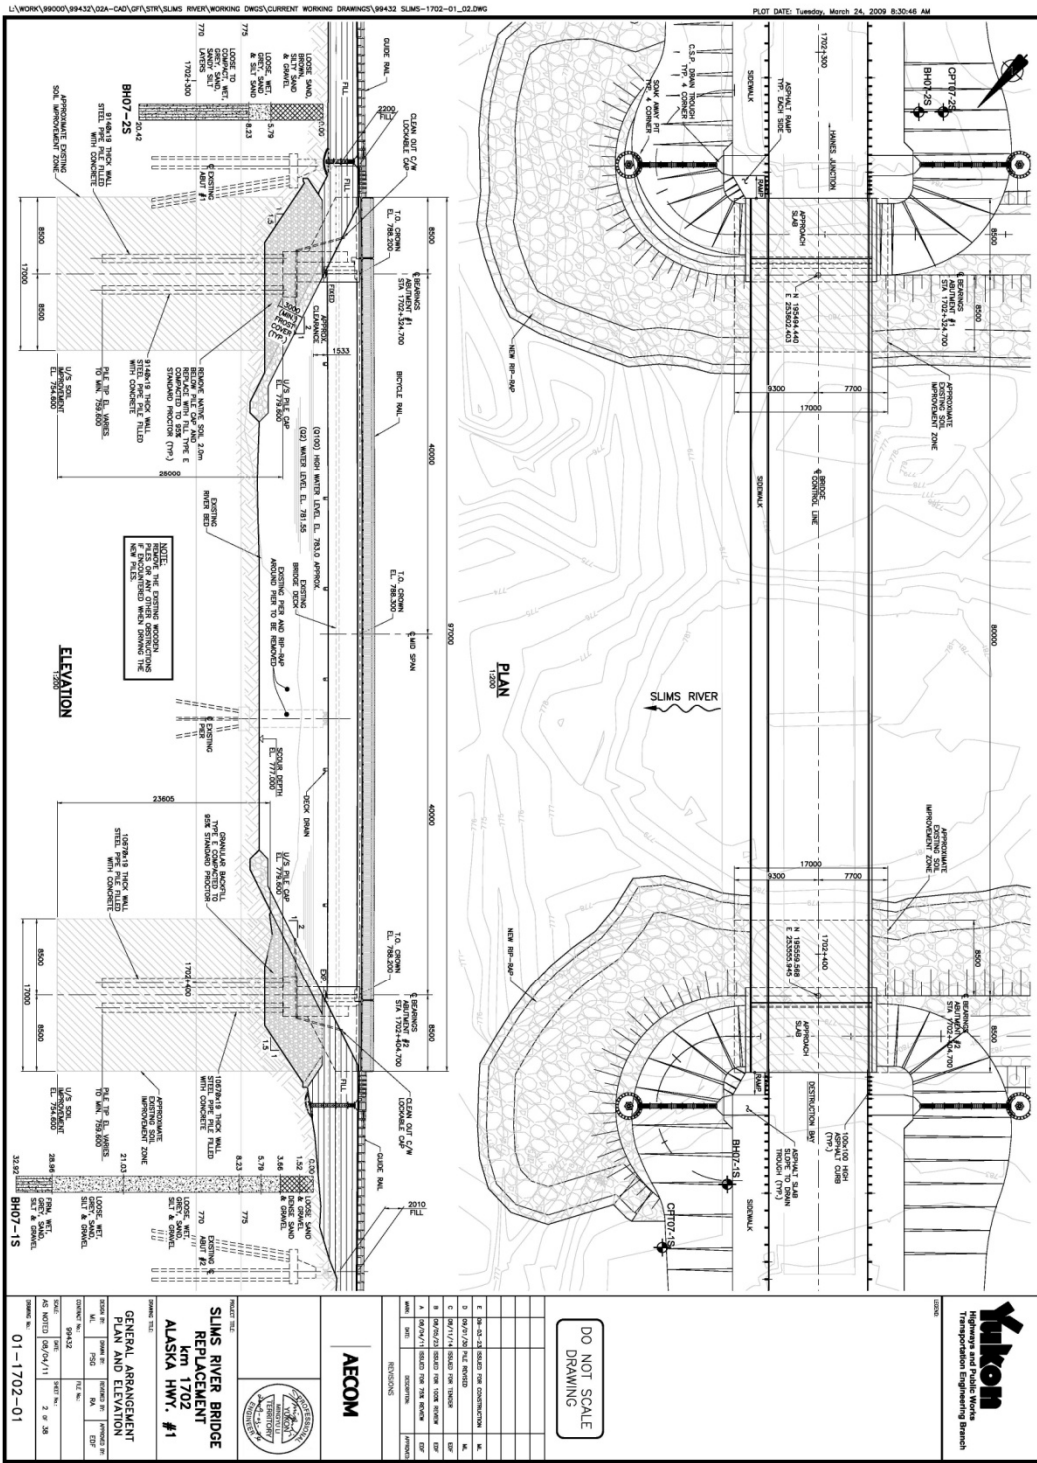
Bridge #2 – Plan, Elevation, & Section
